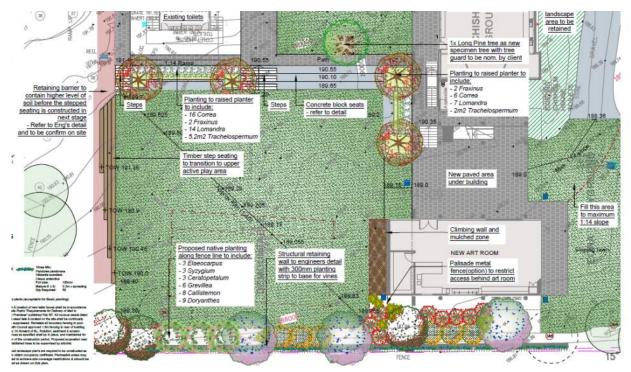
Extract of Landscape Plan (Source: Conzept Landscape Architect)
